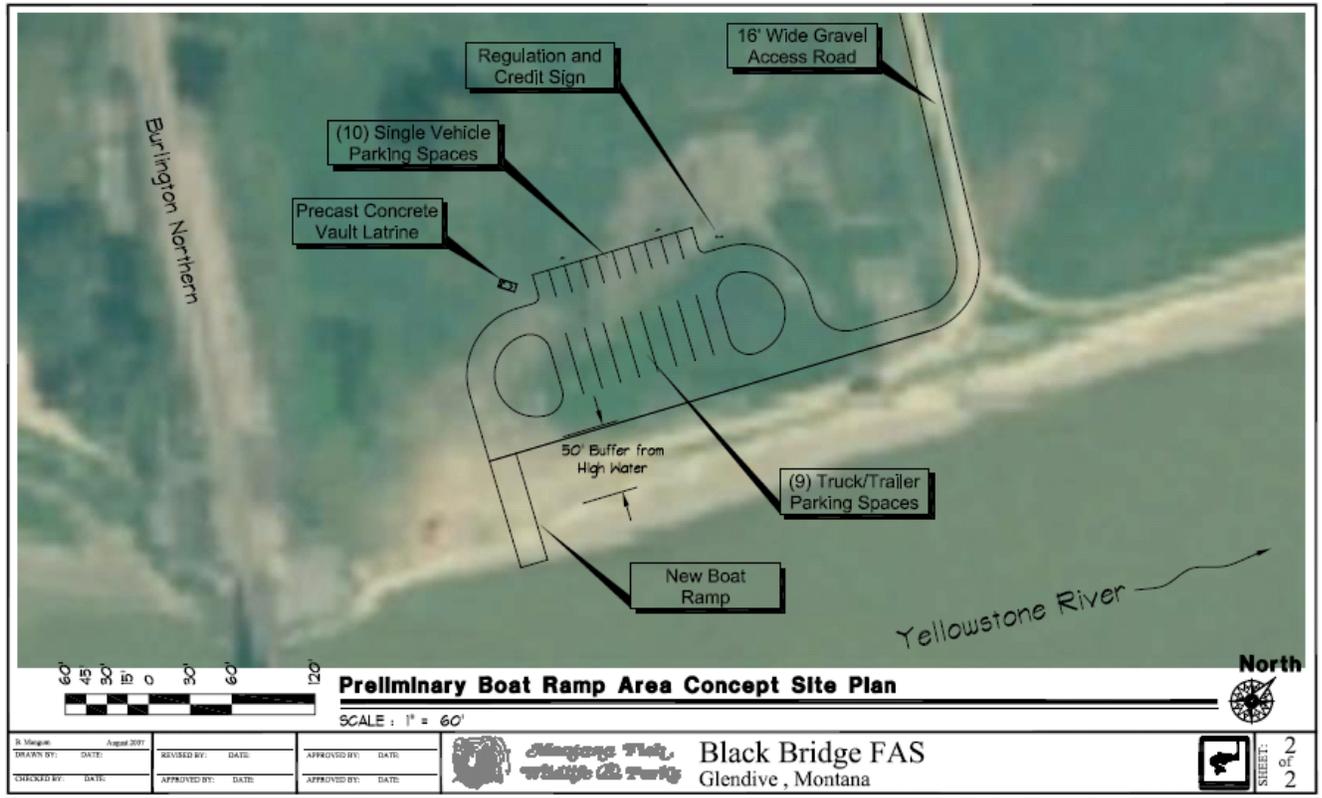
Preliminary site plan for proposed development of boat ramp area at Black Bridge FAS
